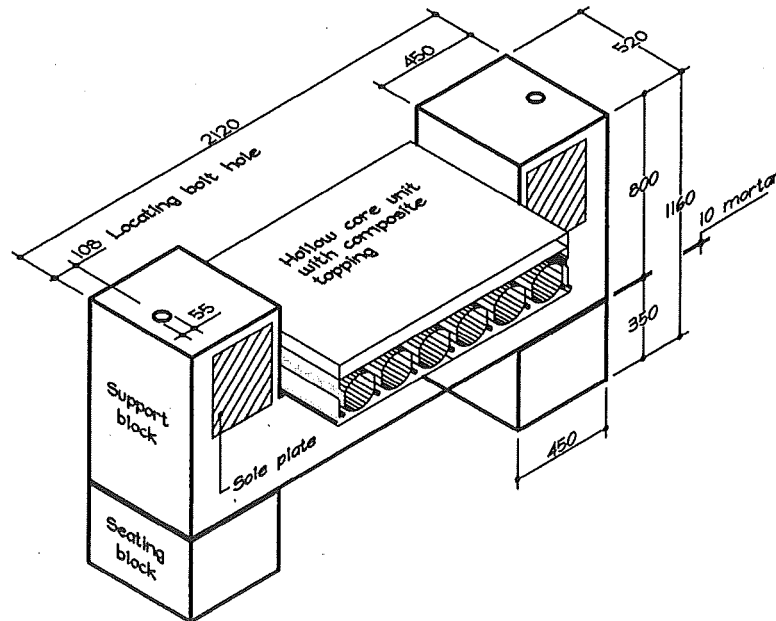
(a) Detail of precast concrete support beam and seating blocks
